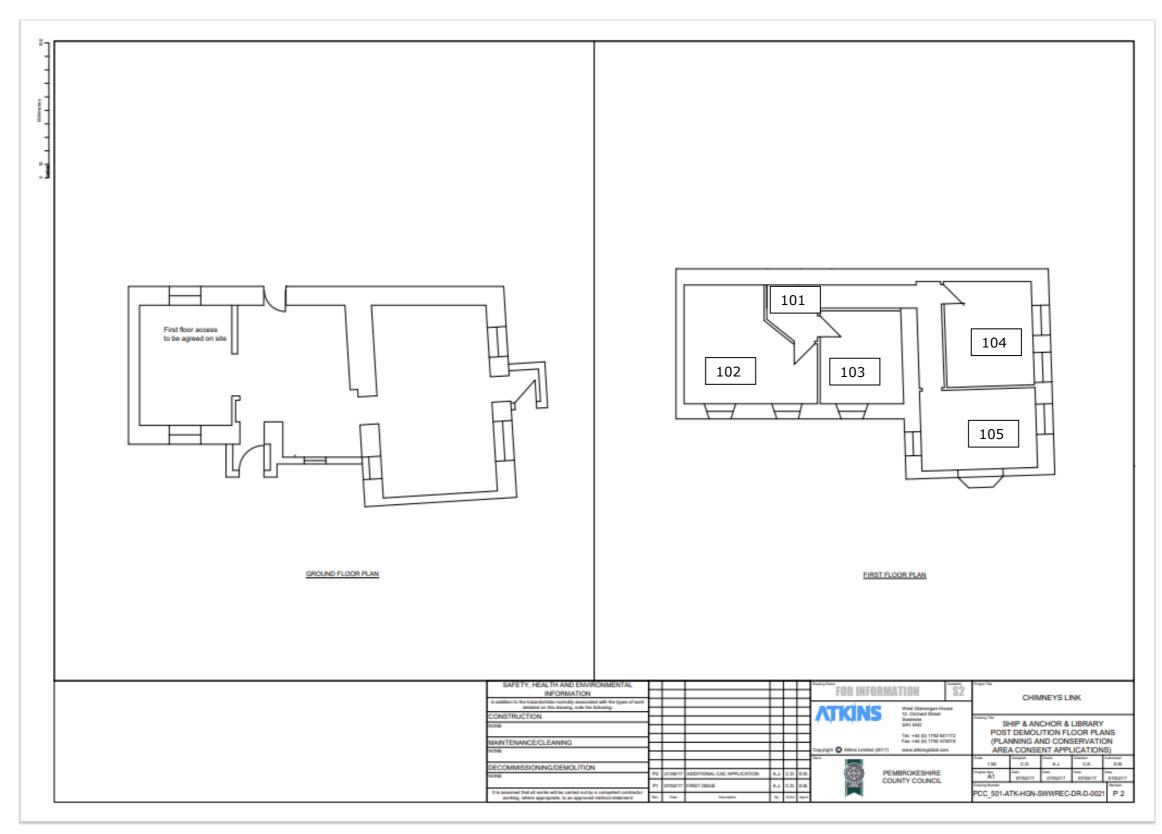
Labelled plan of the 1st floor of the former Ship and Anchor public house.
